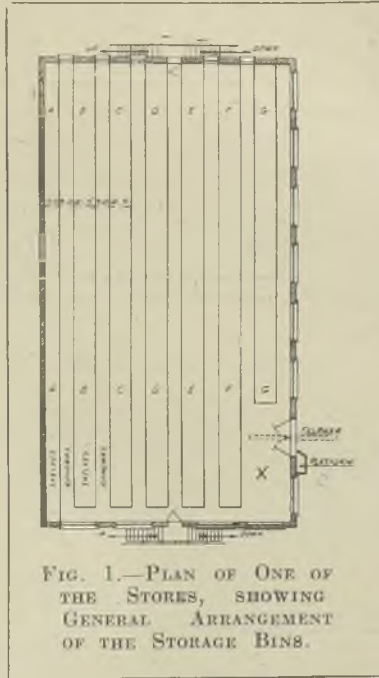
PLAN OF ONE OF THE STORES, SHOWING GENERAL ARRANGEMENT OF THE STORAGE BINS.
